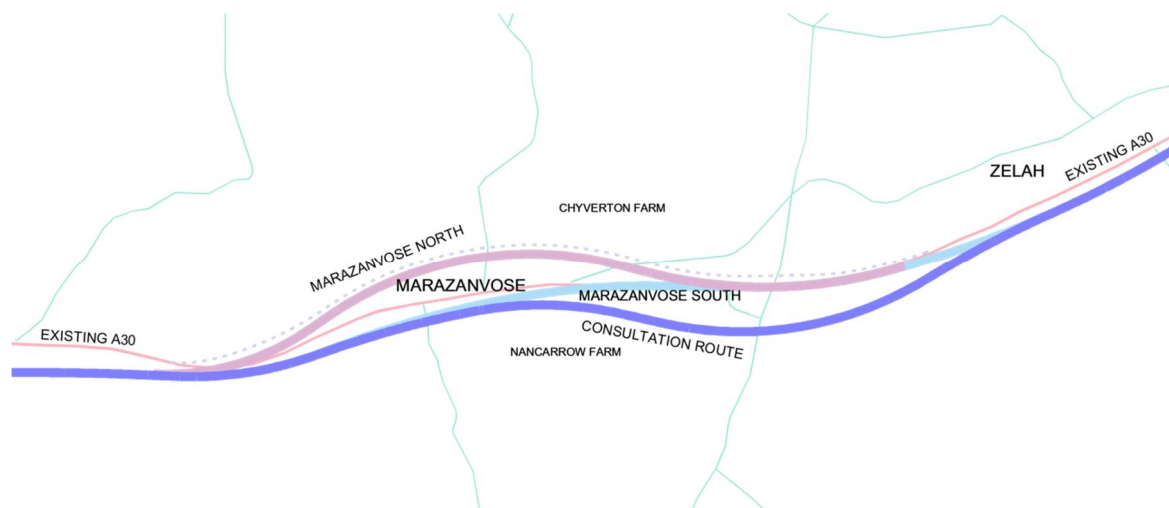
Alternatives between Town and Country Motors and Zelah bypass
